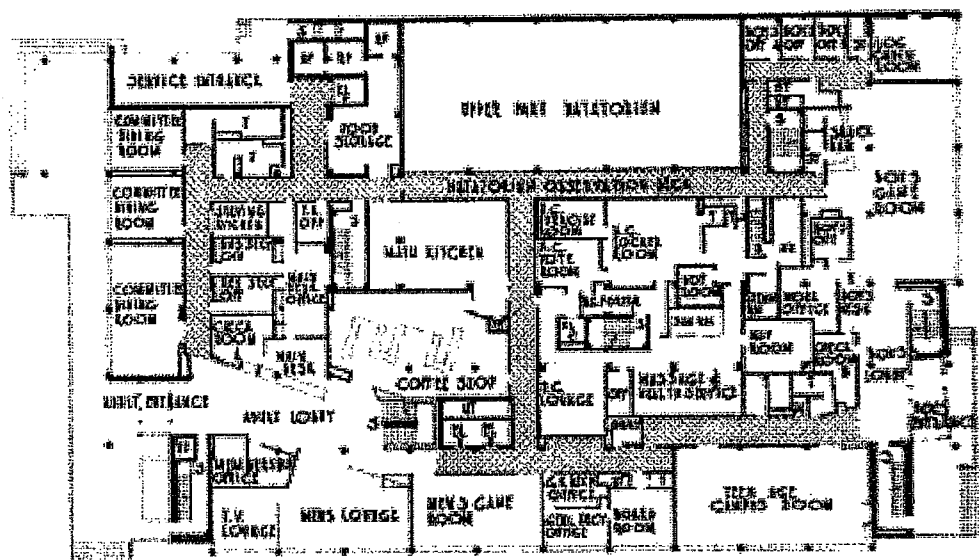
YMCA Floor Plan-Basement Floor (scanned image)
